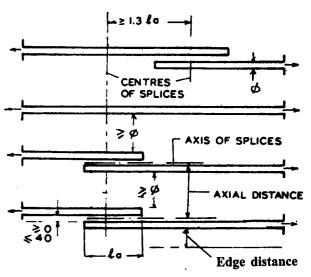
Longitudinal staggering and transverse distance of reinforcing bars in the region of lap splices (dimensions in mm)
